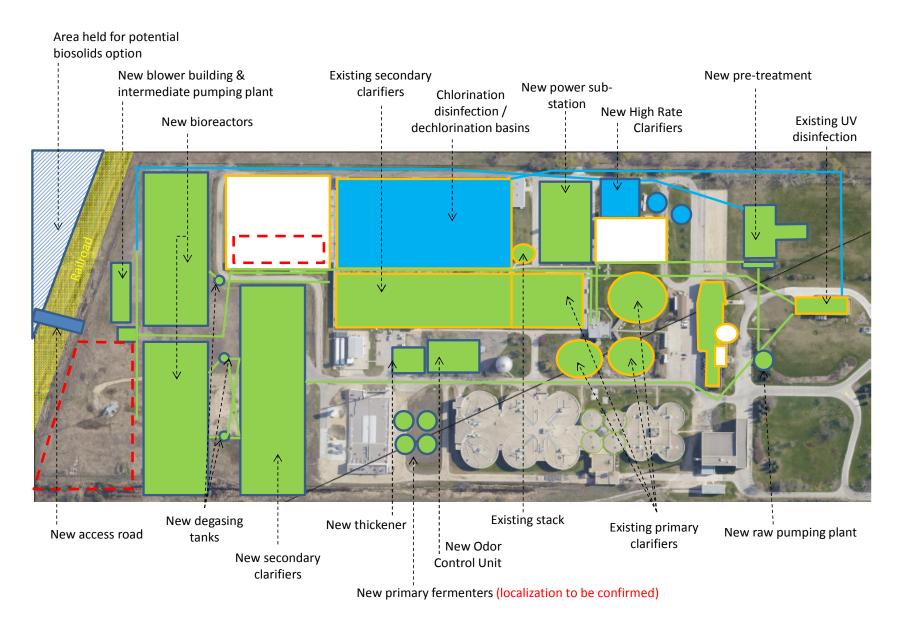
NEWPCC preliminary layout with indication of the reused buildings
